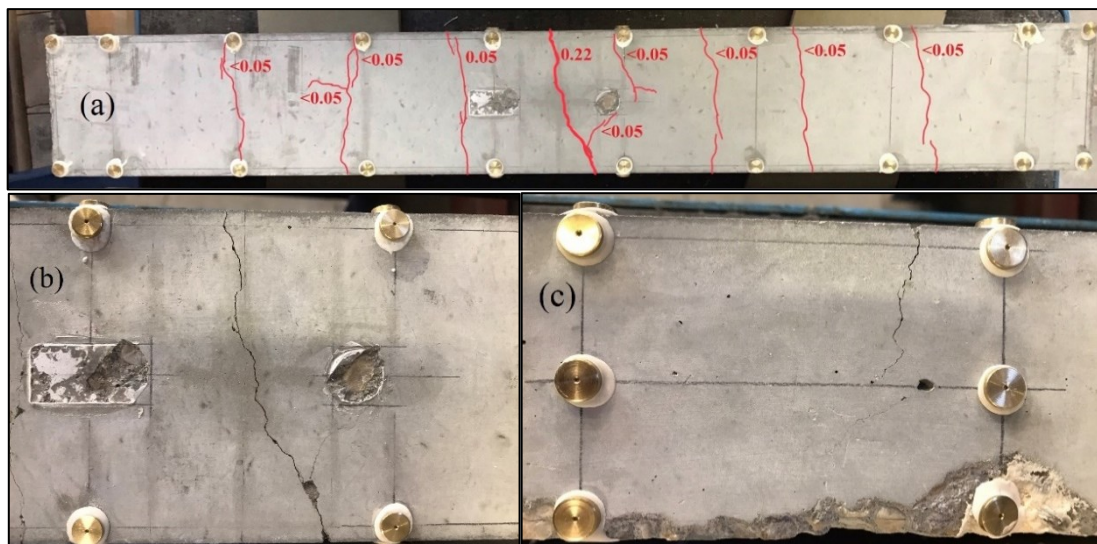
C4 cracks configuration: (a) Mapping, (b) Main crack top view, (c) Main crack lateral view
